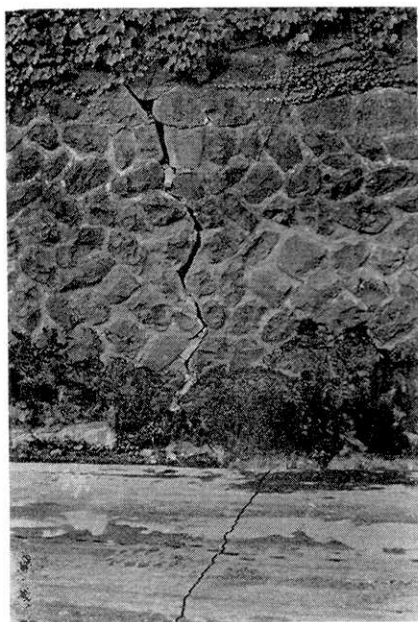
Crack transversing the asphalt road at Sakanazawa, Higashinaruse-mura.
